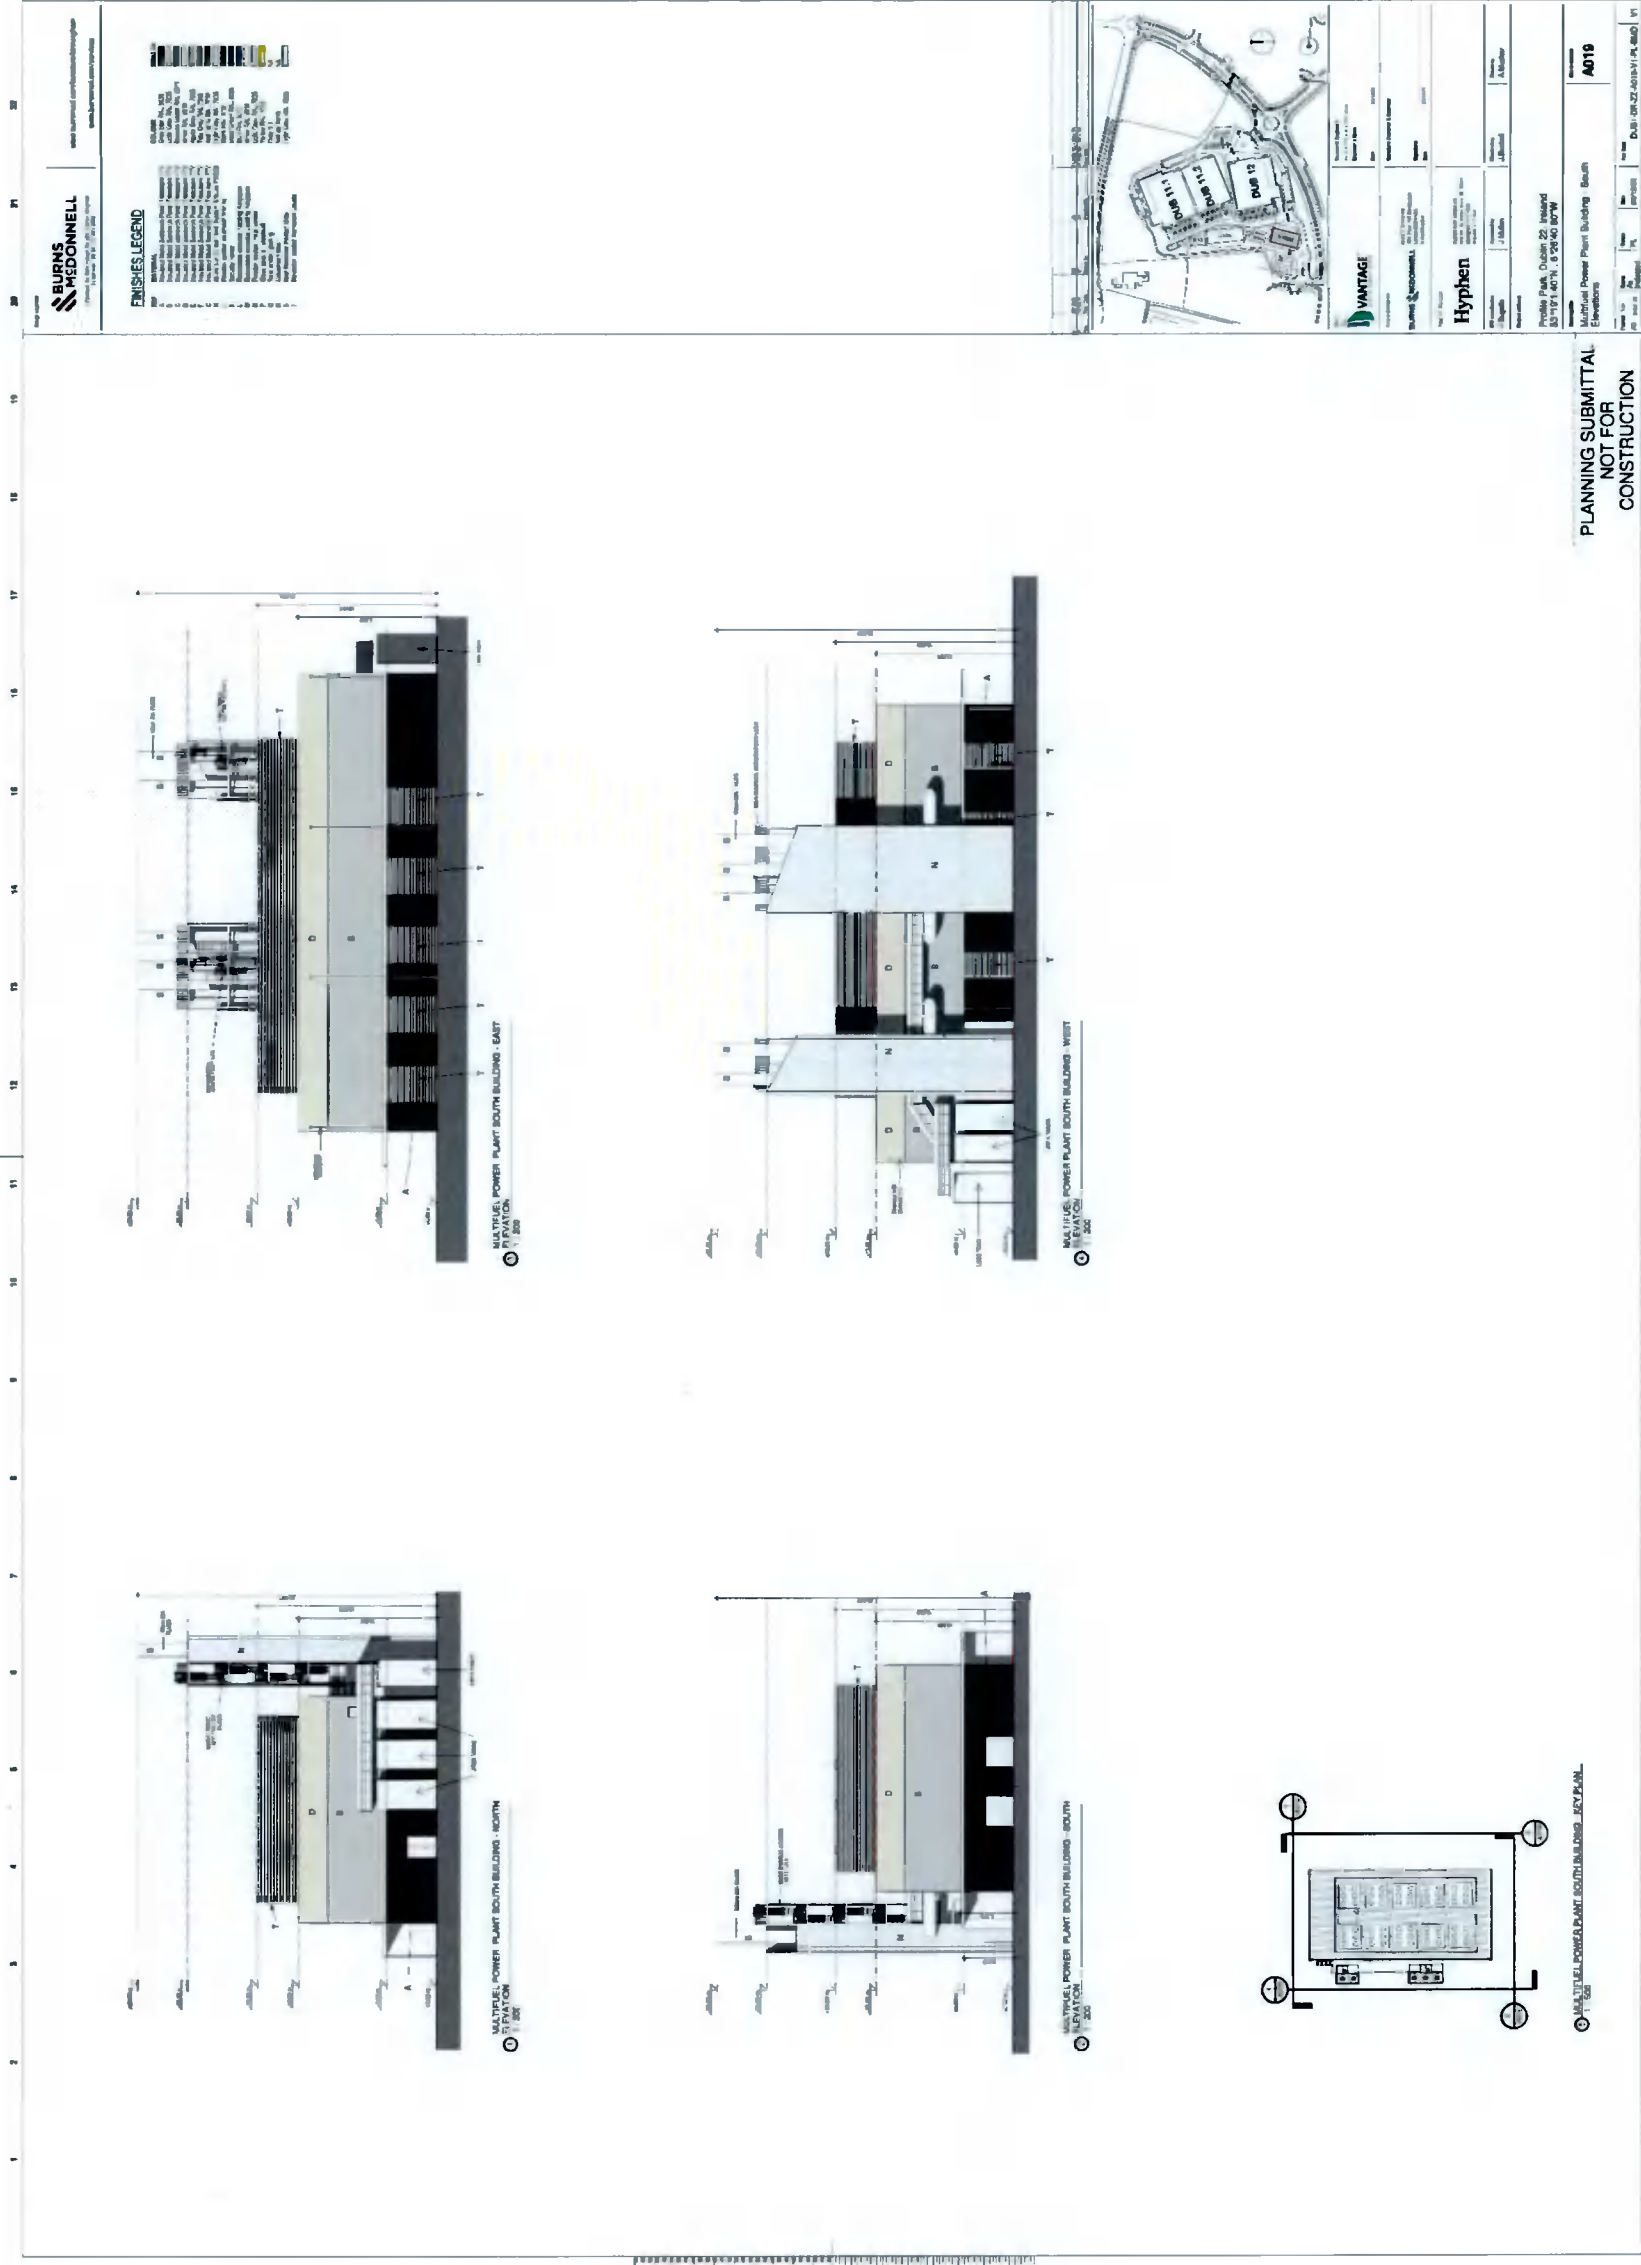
MFGP South Building Elevations (Source Burns & McDonnell)
